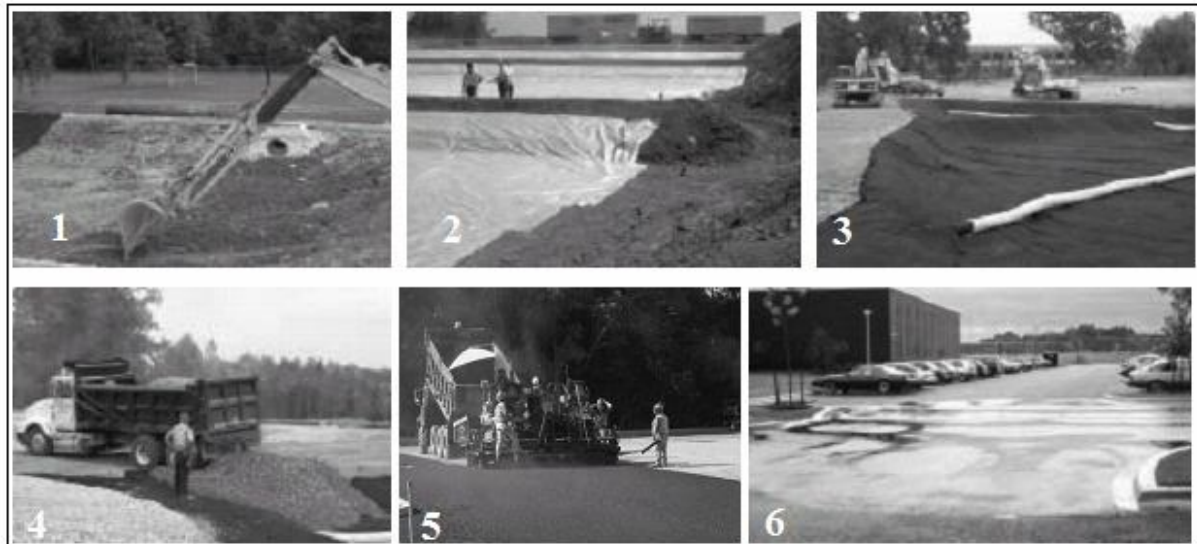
Construction sequence of porous asphalt pavements (Cahill et al., 2003).
